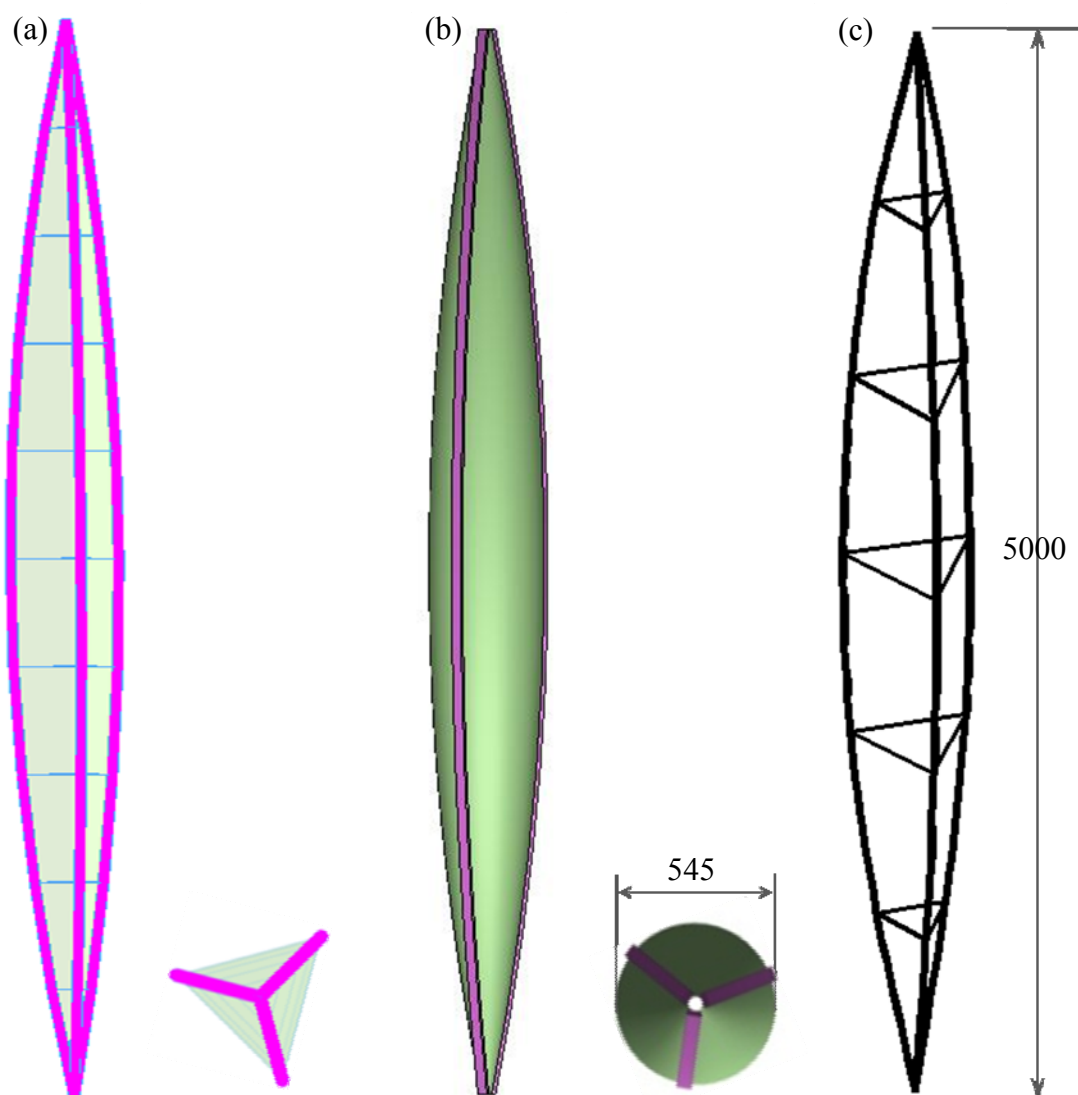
Main dimensions of three column systems to be compared: (a) TSS column; (b) Tensairity column; and (c) truss column (unit: mm).
